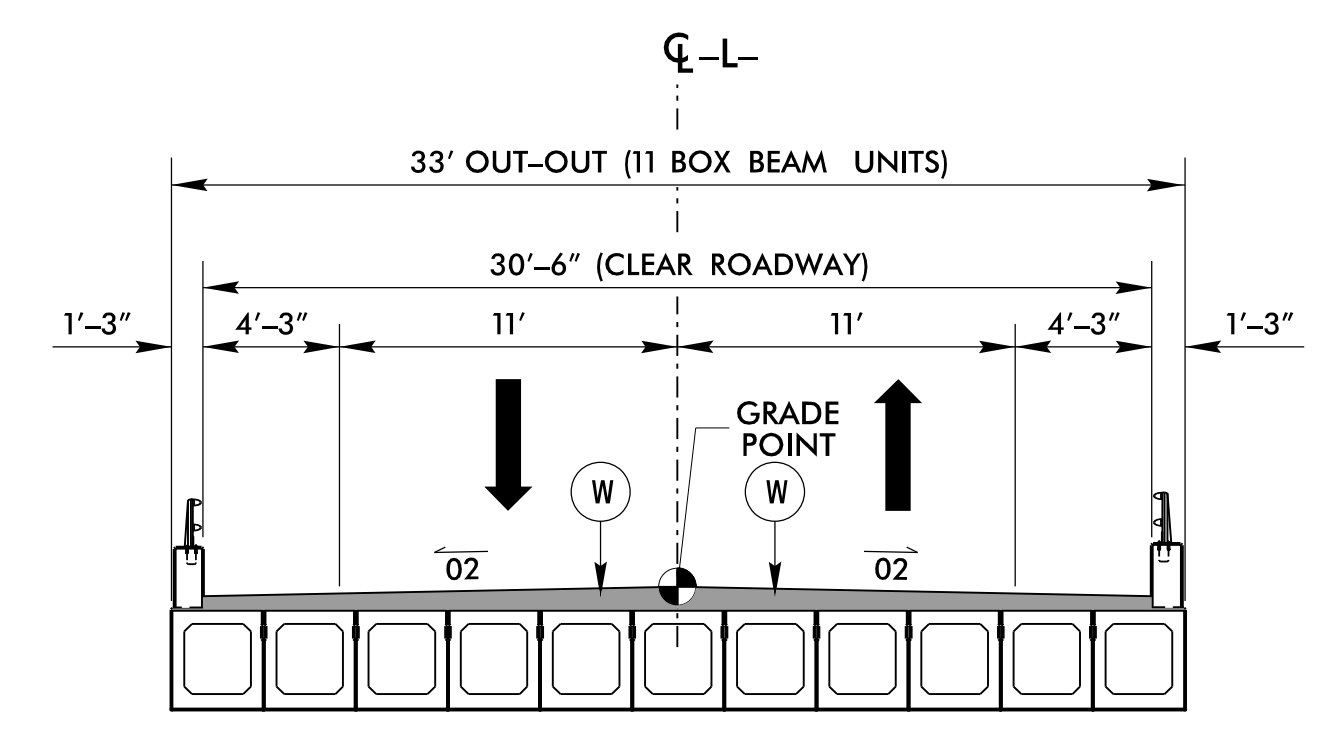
DETAIL SHOWING PAVING TO THE FACE OF GUARDRAIL
